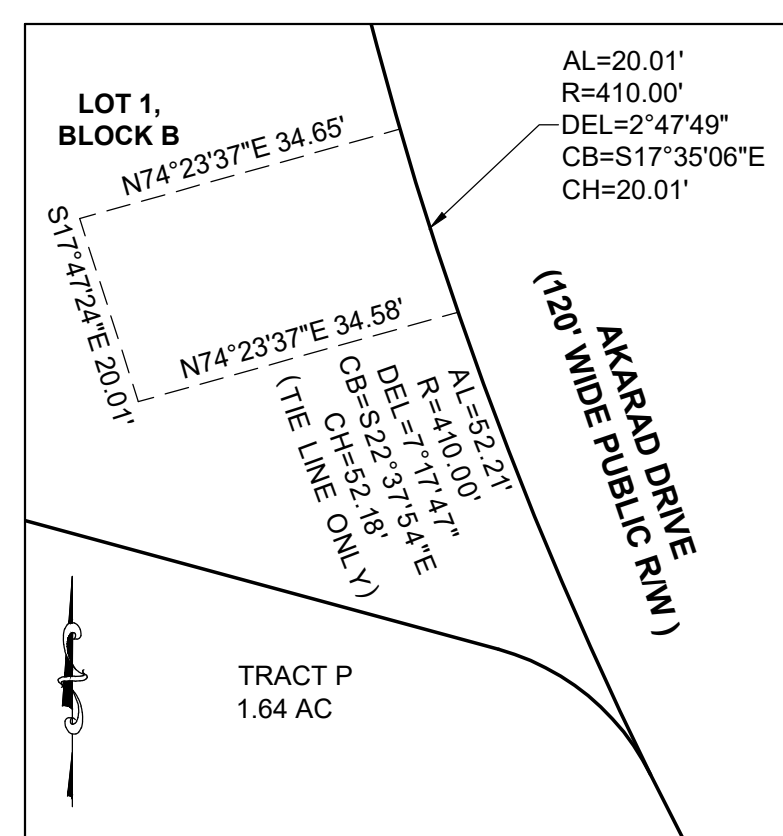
DETAIL J, PUBLIC DRAINAGE EASEMENT (SEE SHEET 12)
